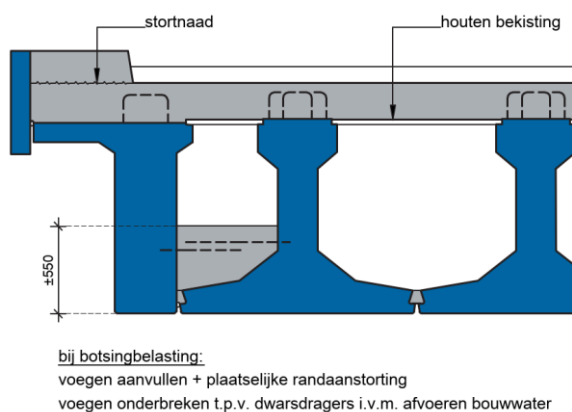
Cross section ZIP-girder with extra strengthening (Spanbeton, n.d.-b)
